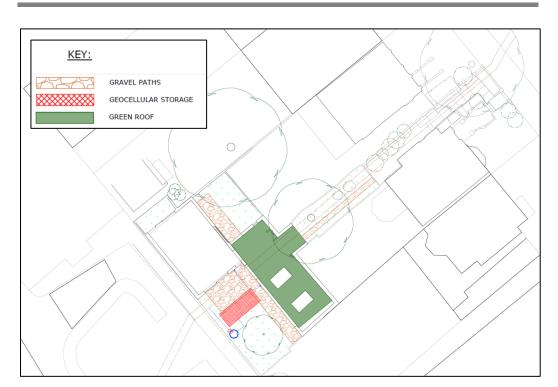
Indicative drainage layout plan showing the proposed location of SuDS.
